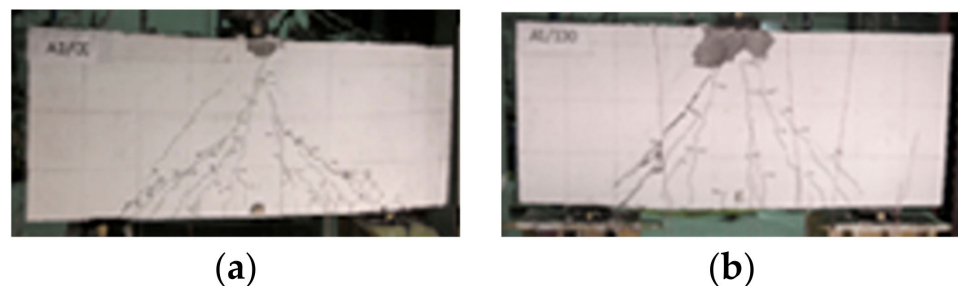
Sample images of the crack patterns at failure: (a) Specimen A1/00 and (b) Specimen A1/100.
